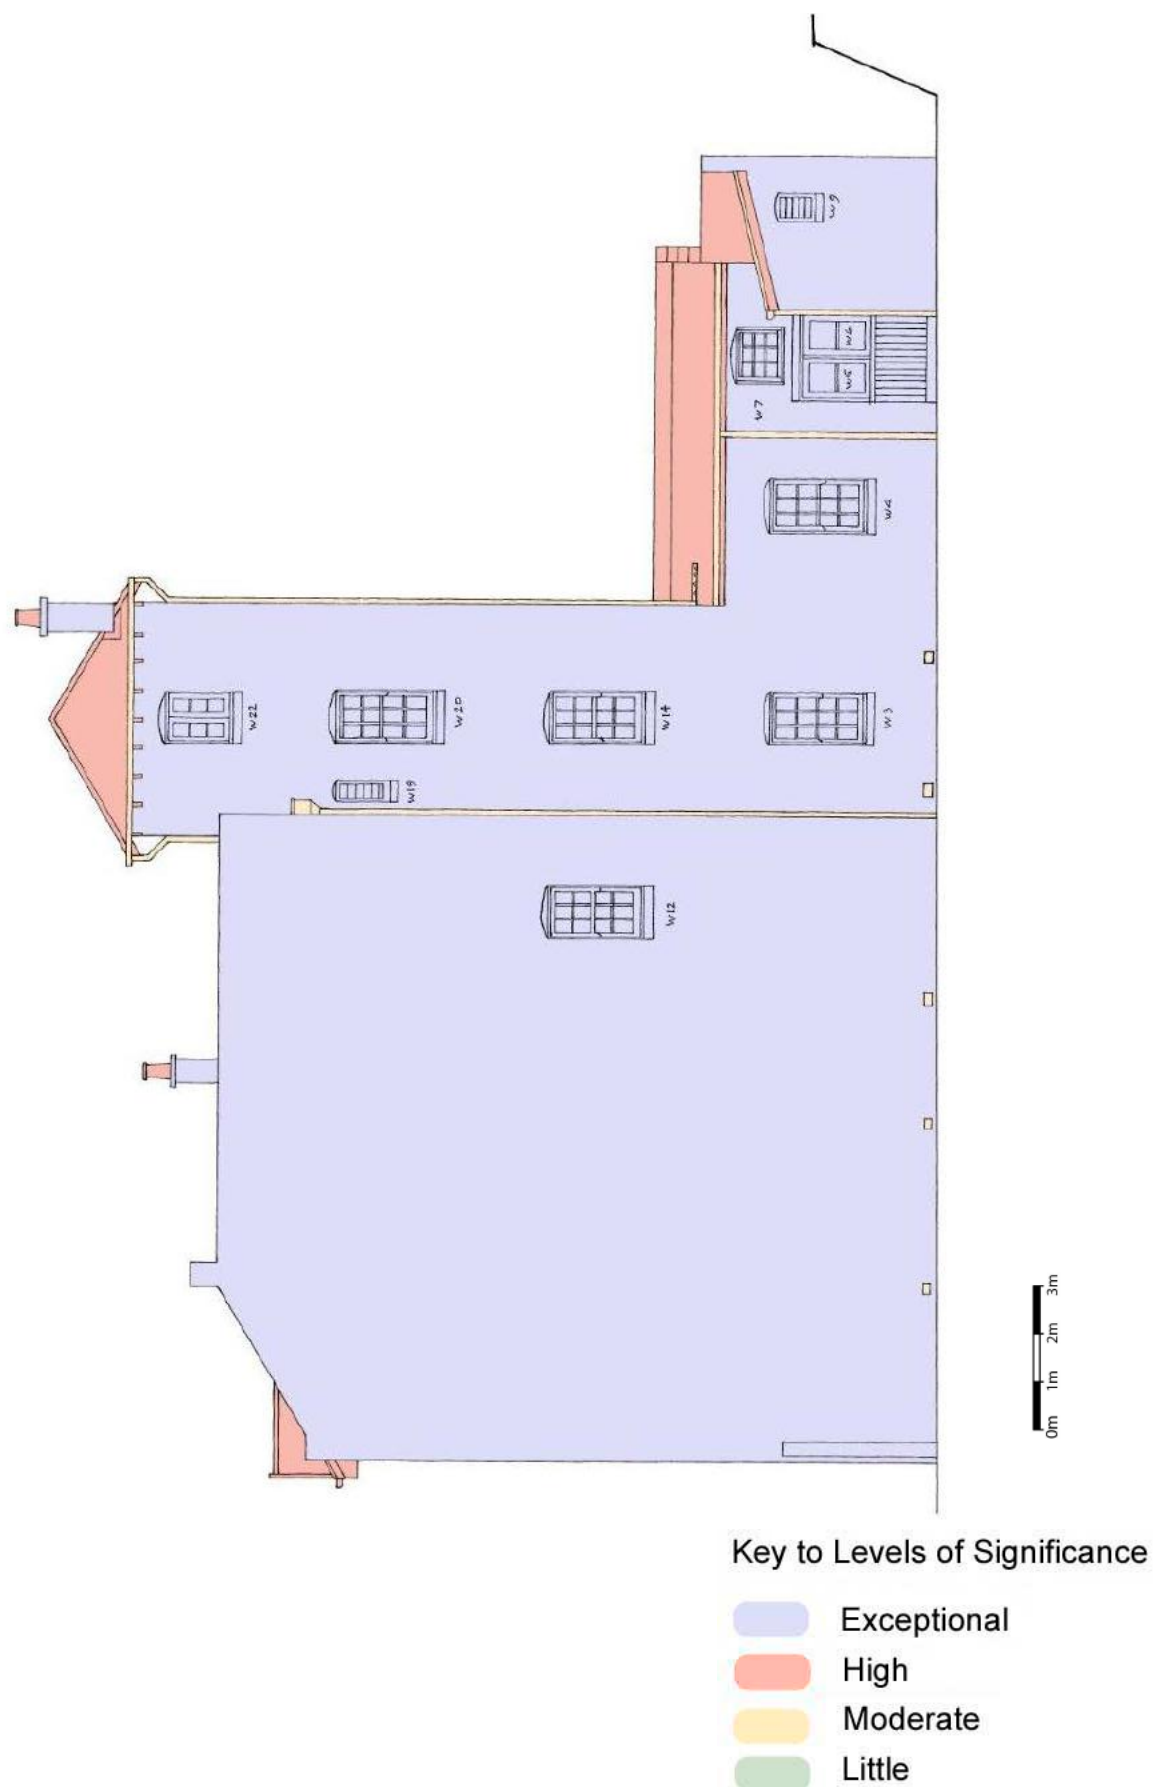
117-117A Gloucester Street – North elevation grading of significant elements and fabric
